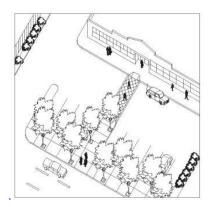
Figure Exception to 20.50.240(A)(2): Example of design elements to connect the building frontage to a street across a parking area.
